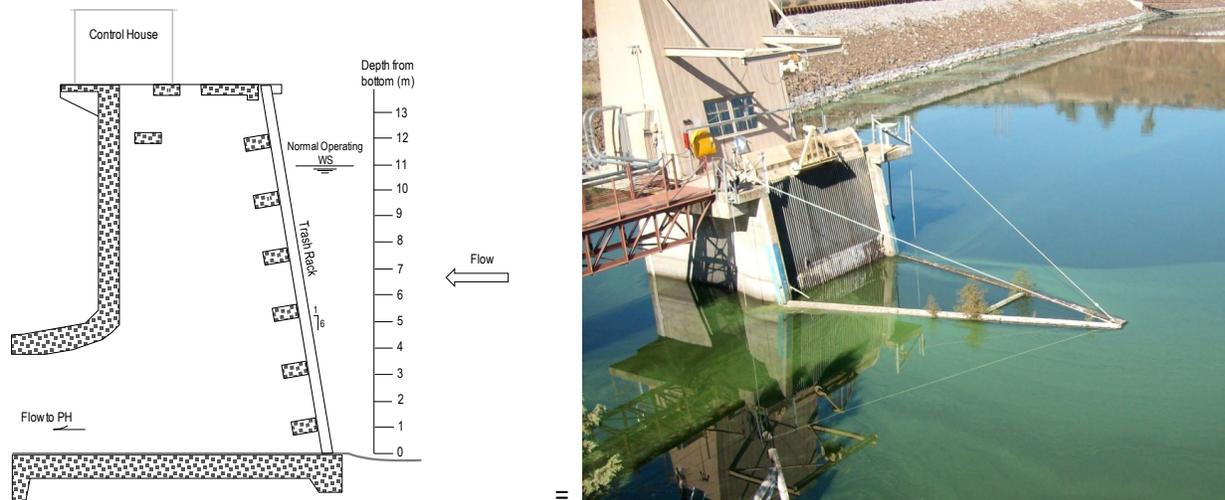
Elevation profile schematic of the Iron Gate Powerhouse intake tower illustrating reservoir operating water surface elevations and vertical extent of trash rack (left) and photograph of intake tower showing open trash rack at reservoir surface (right).
